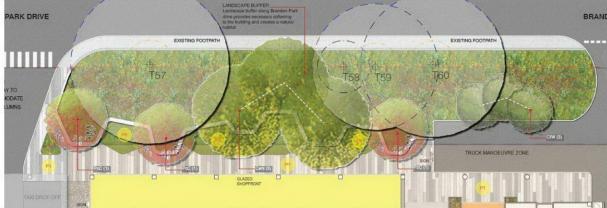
Proposed landscaping within the setback to Brandon Park Drive Source: SLS Landscape Concept Plan
